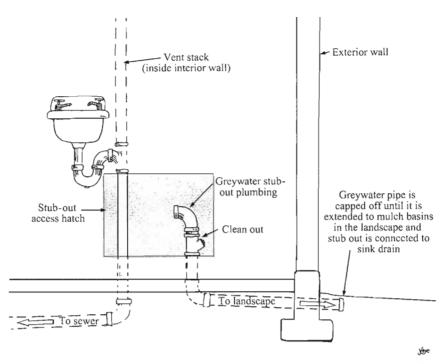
A. Stub-out not yet connected. A bathroom sink and drain with a greywater stub-out which is capped off and waiting to be hooked up to the greywater flow. The stub-out can be made accessible for later hookup by installing a removable section of drywall or latched door, or by leaving it exposed within a below-sink cabinet. Note: the stub-out should exit the building as high as possible (even above grade) for the maximum number of gravity-fed distribution options within the landscape
